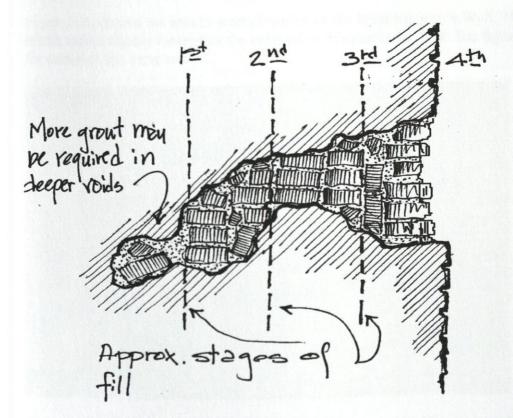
Sketch partial section through a typical void showing basic repair with mud bricks and mud brick bats.
